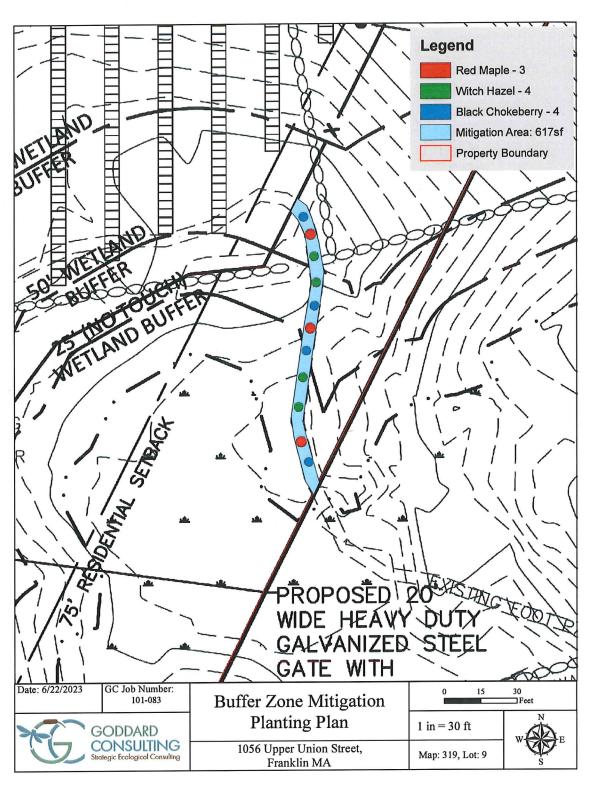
Site plan excerpt showing proposed planting plan overlay.
